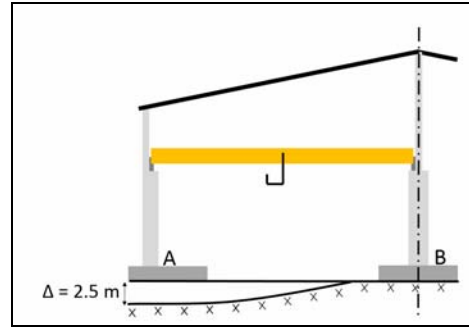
Simplified section of factory hall with foundations supporting main construction and crane rail.
